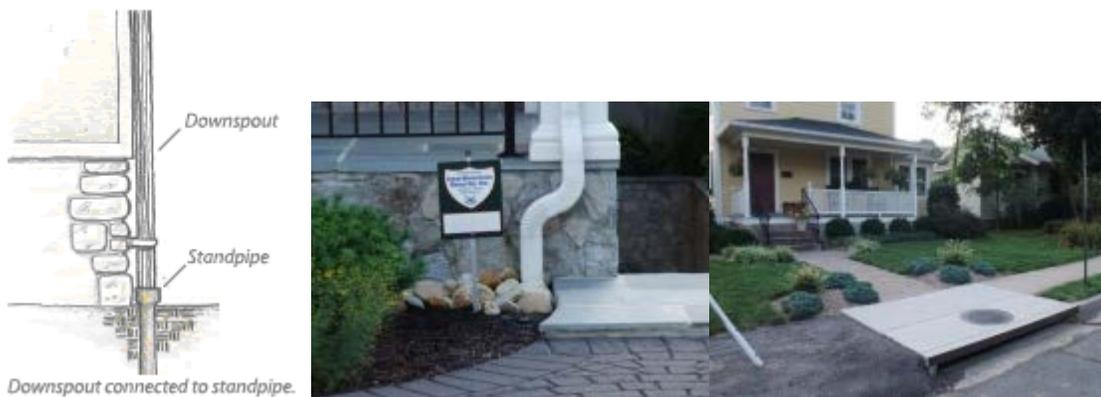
Different ways a downspout can be connected. Starting at the left: Downspout connected to sewer intake pipe (standpipe), downspout directly connected the storm sewer system, and downspout discharging to driveway, which discharges to road and storm sewer system.
